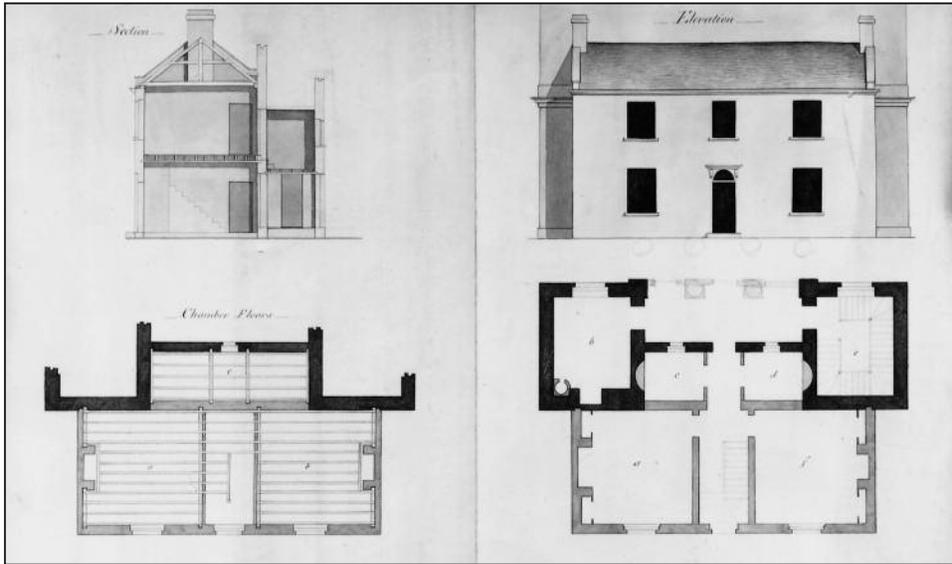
Thomas West, plan, rear elevation and section of the proposed alterations to the Park Building, 1802. *British Library*.
